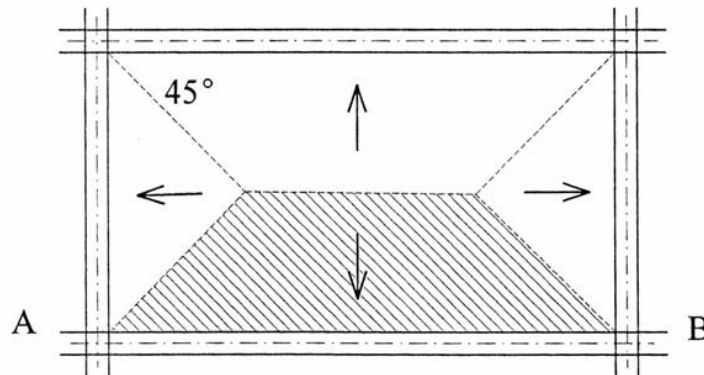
Supporting beams' contributing areas for reinforced concrete floor system.
